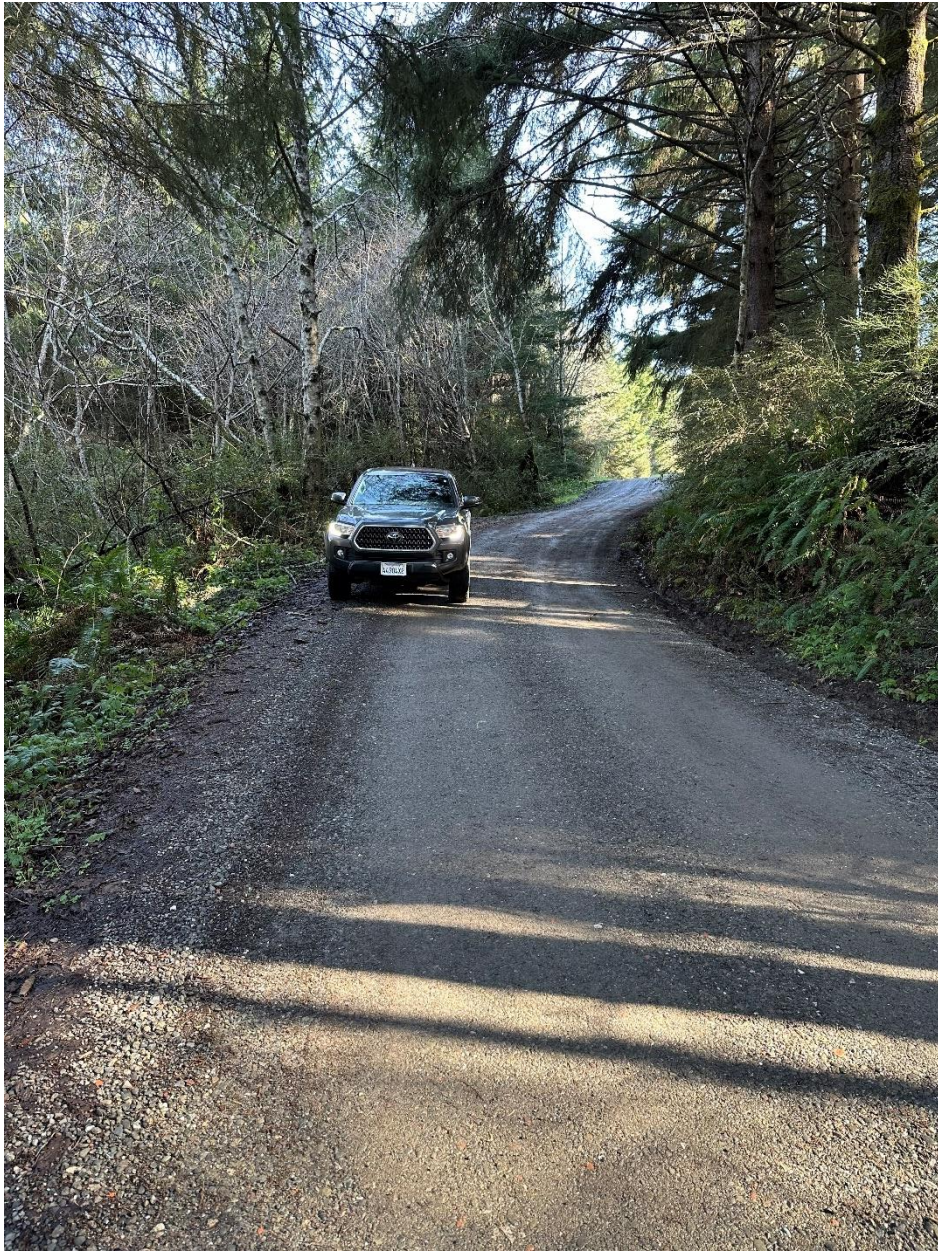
RP 6, typical section of Hooven Road. Photo Taken facing east, vehicle traveling west.
